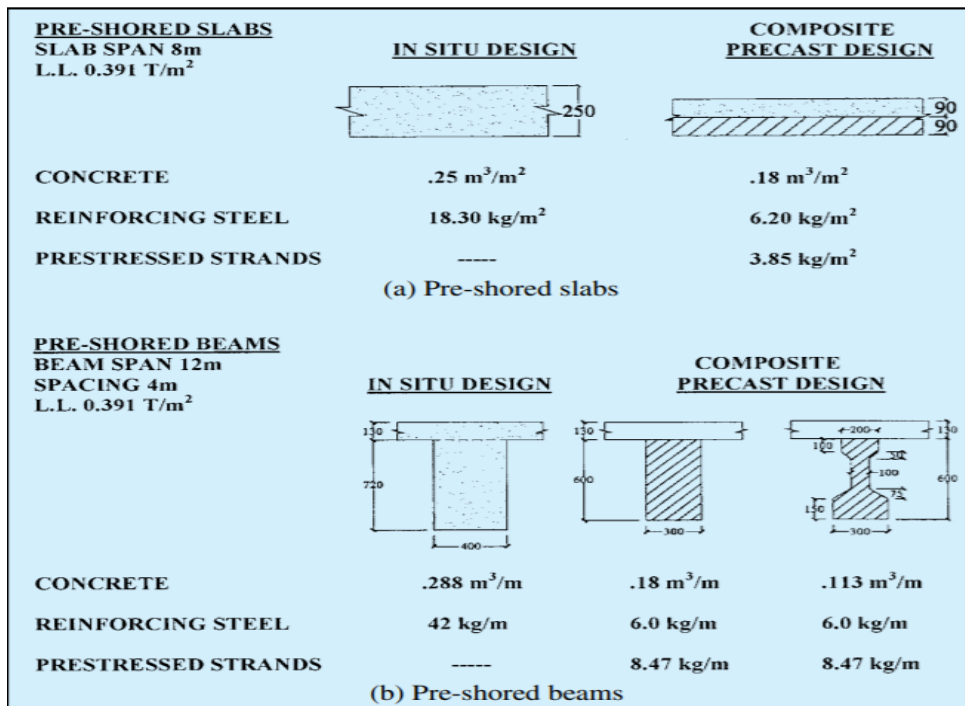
it shows material saving using precast concrete (Yee, & Alfred, 2001)
